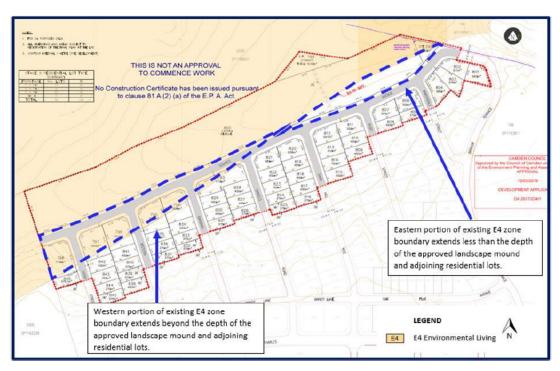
Approved Subdivision Plan for Stage 8 Arcadian Hills (DA/2017/234/1) and Current E4 Zoning Overlay
